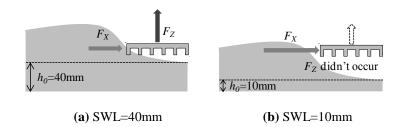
The mechanism of a tsunami wave load subjected to a bridge deck
